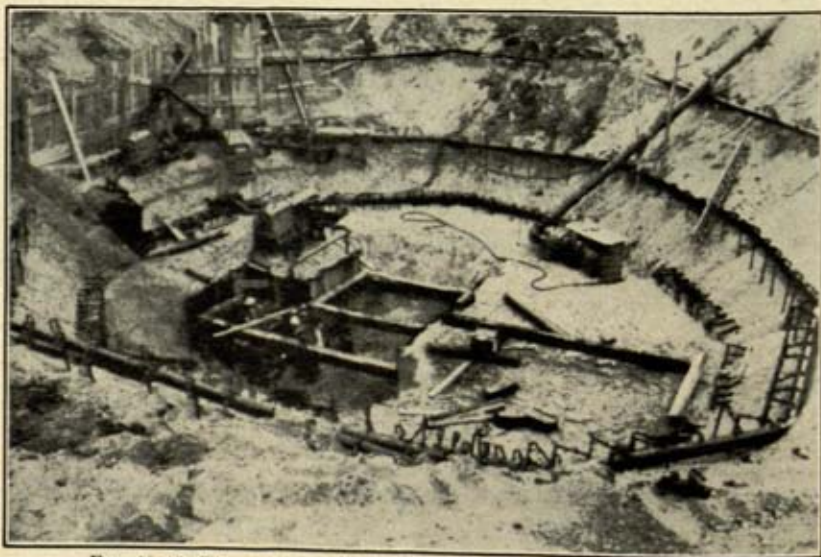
Three-stage wellpoint installation. (*Moretrench Corp.*)
